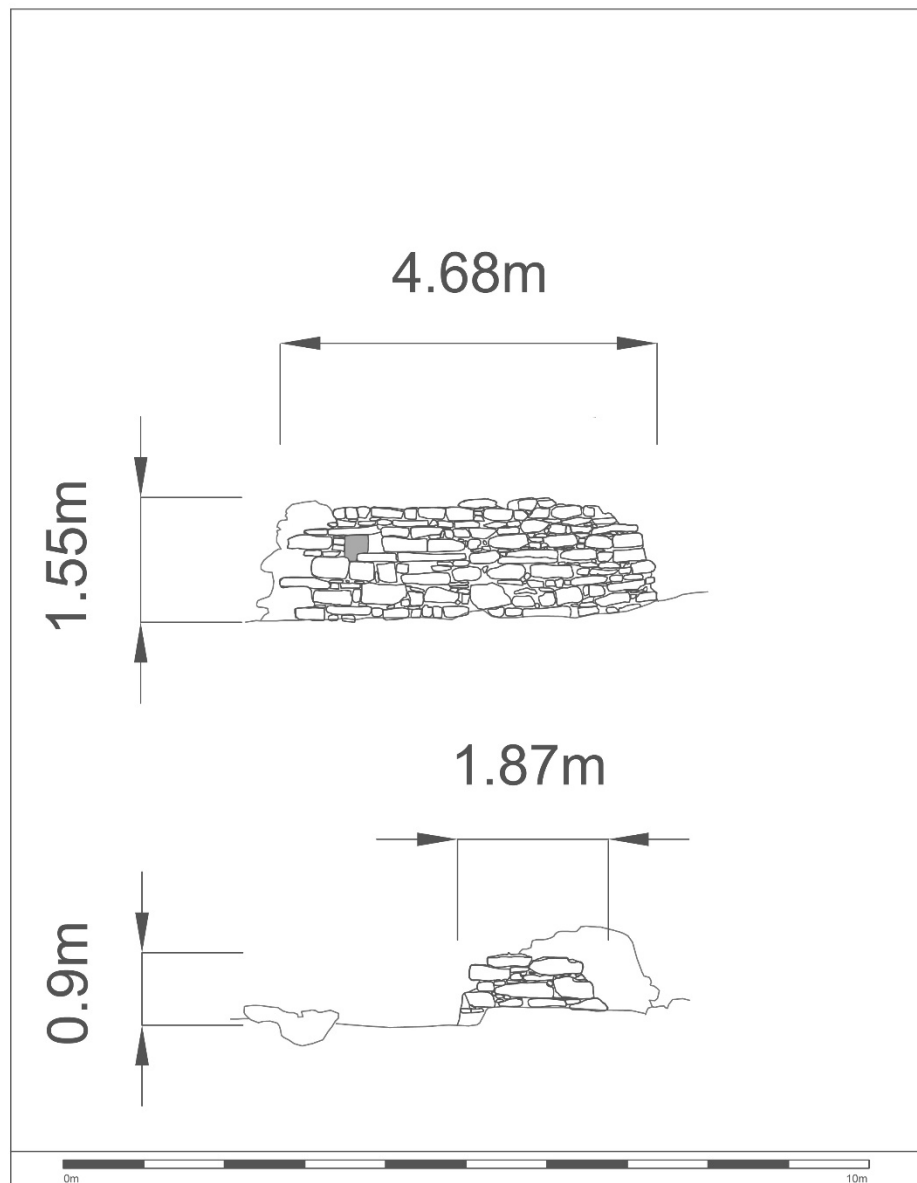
External elevations of the south-east (top) and north-east (bottom) walls of the collapsed or unfinished signal tower at Lenadoon Point Signal Station. The chute passing through the south-west side of the south-east wall is shaded in grey.
